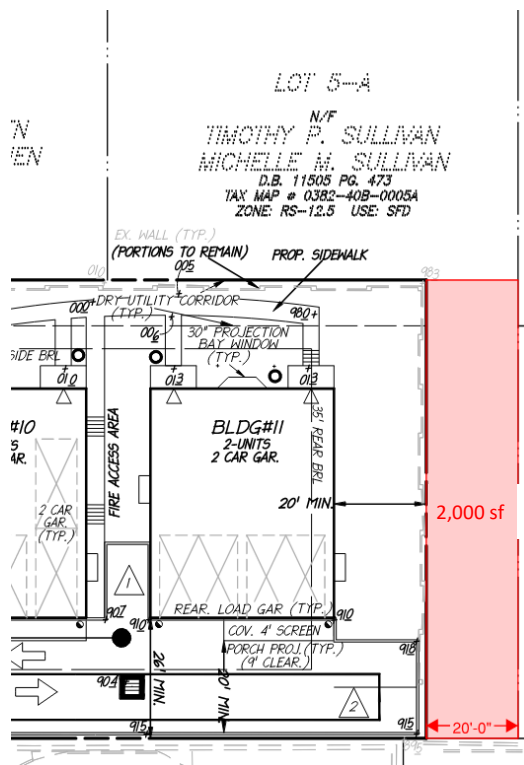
Proposed site plan showing suggested change by Planning Commission to purchase and add 20' by 100' area of adjoining property to the subject site.
